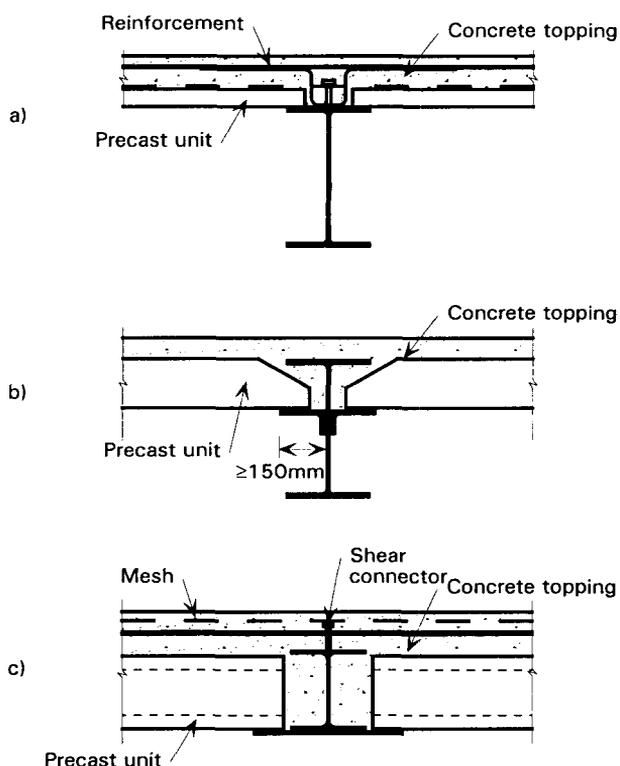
Typical details employing precast concrete units supported on (a) top flange of the beam, (b) shelf angles, (c) slim floor beam
